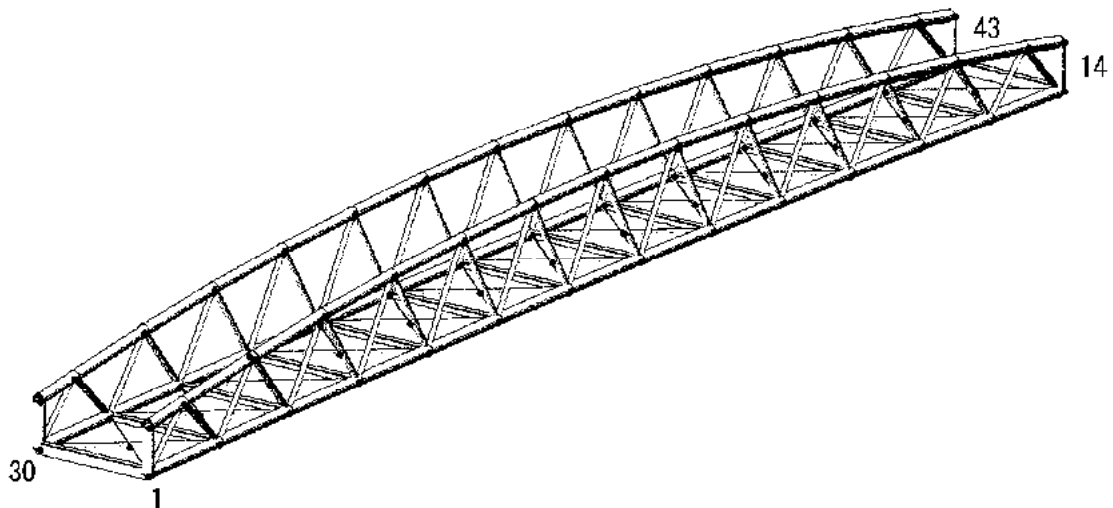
Footbridge Riviera-Palmeraie – Iso view of the truss general model
